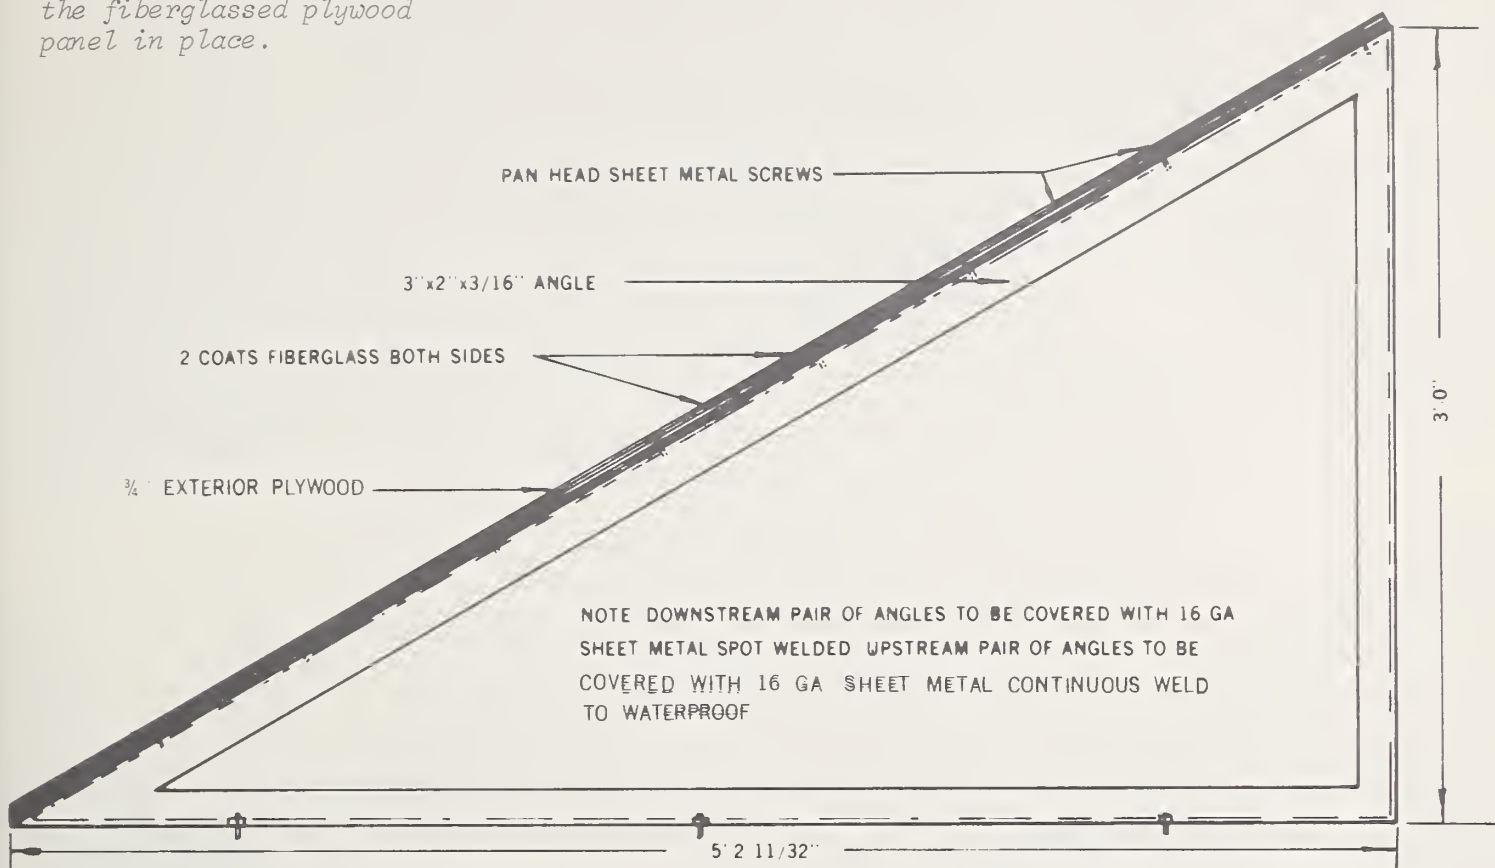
Detail of steel angle support walls with the fibreglassed plywood panel in place.
